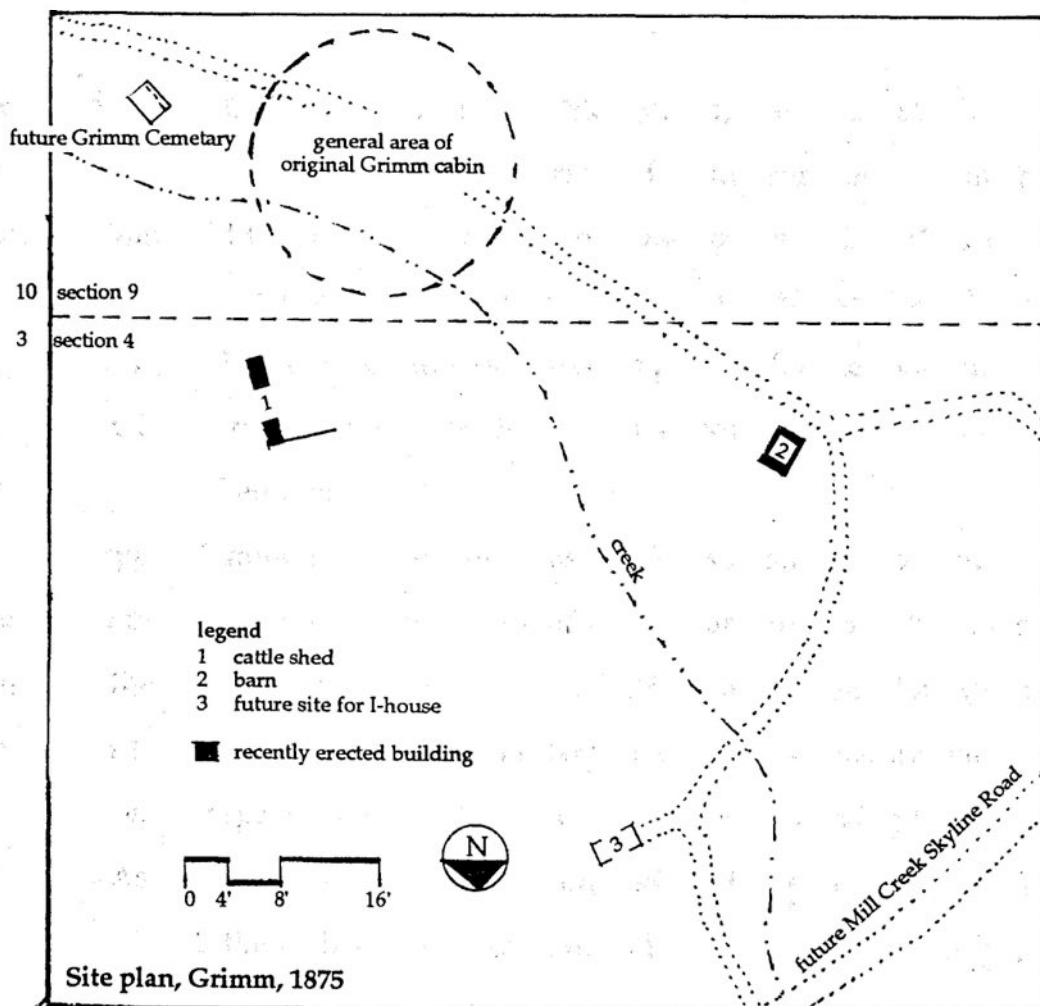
Site plan, portions of sections 3, 4, 9, 10, circa 1875
